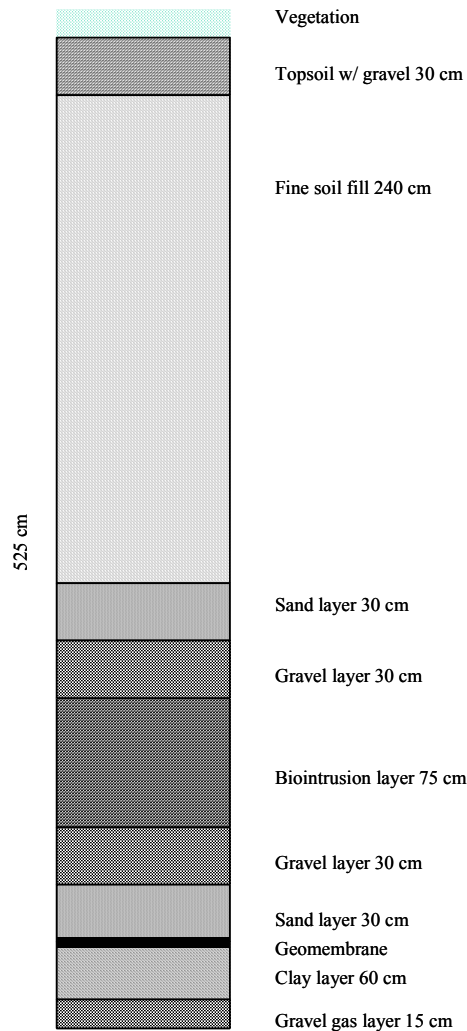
Cross section of the INEEL CERCLA Disposal Facility barrier.
